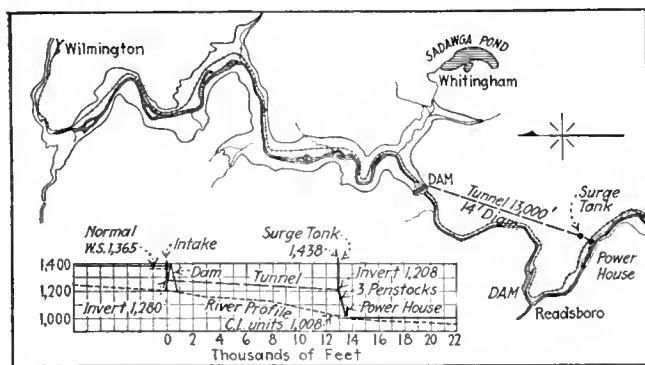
POWER TUNNEL HALF AS LONG AS RIVER BETWEEN DAM AND PLANT
